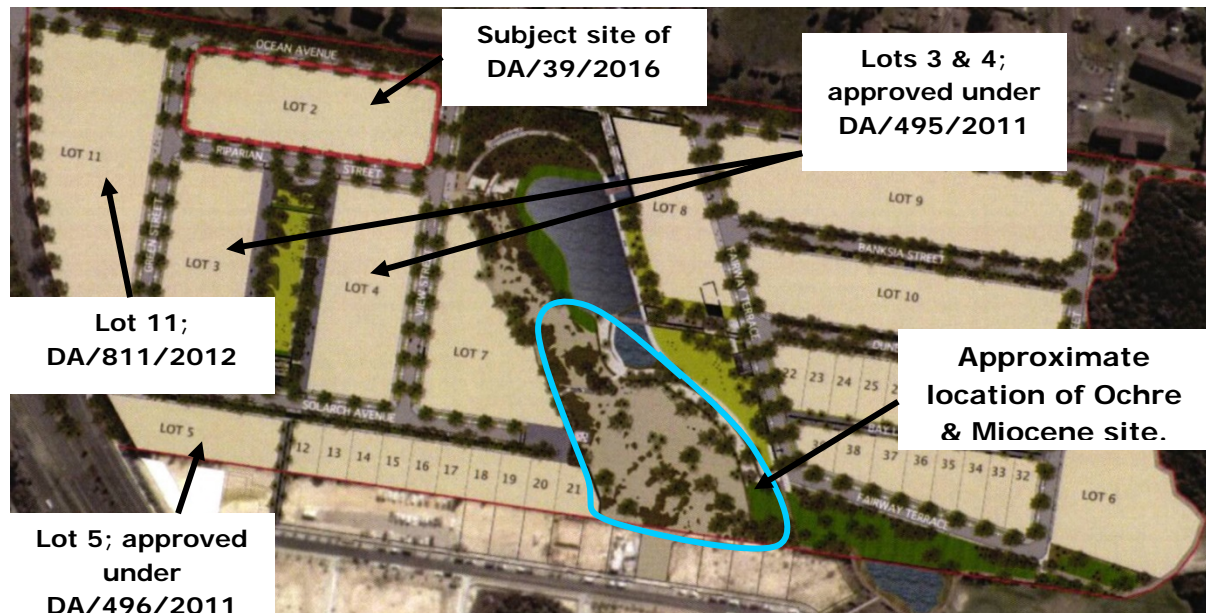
Approved Stage 1 subdivision plan of 1408 Anzac Parade per DA/81/2009. Subject site bound in red. Past Stage 2 approvals identified. Aboriginal Heritage site in blue.
